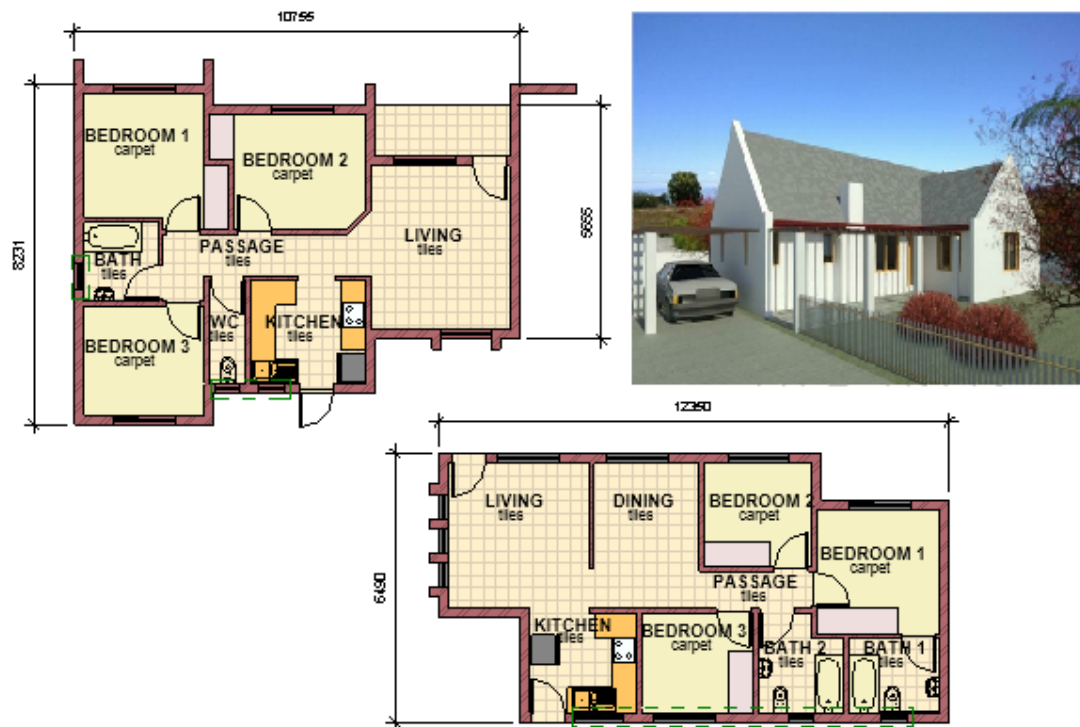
provides an indication of a typical layout of the blocks of units on the site.
